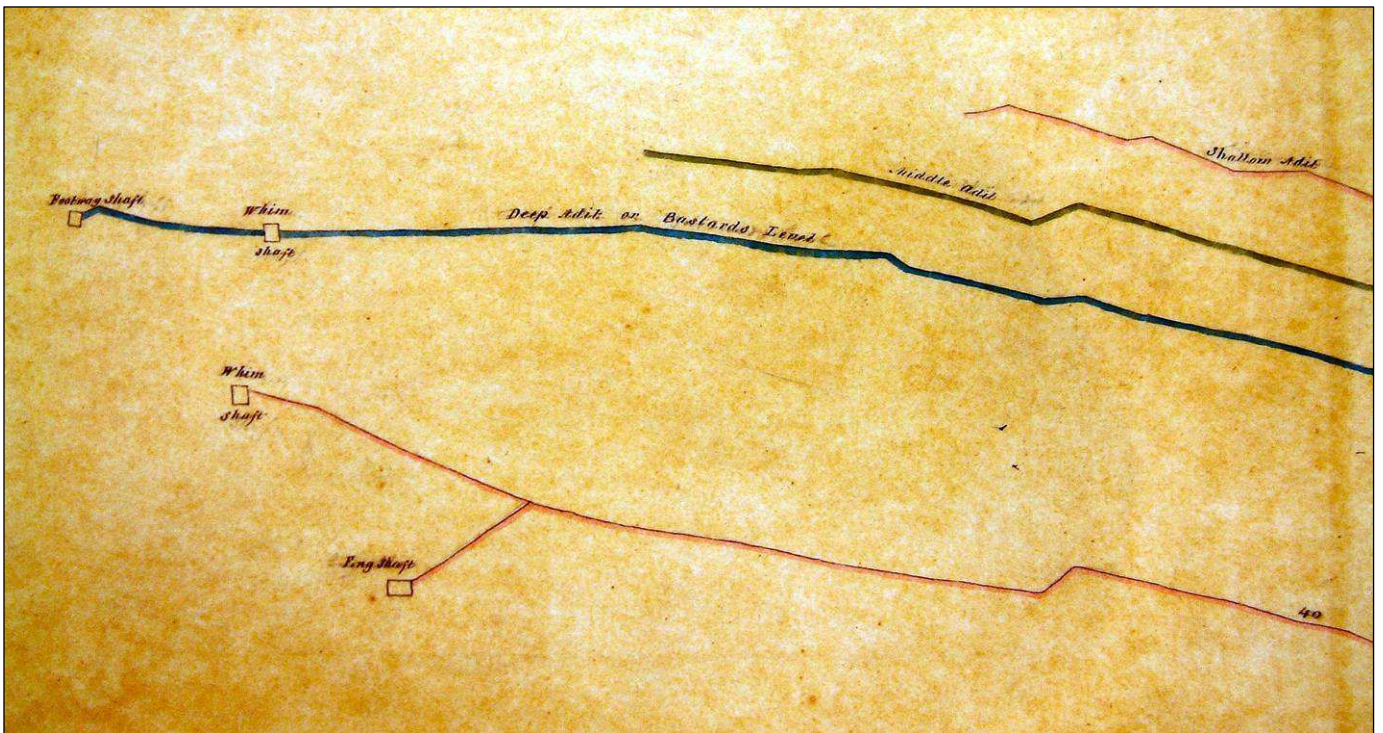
An excerpt of a plan of Devon & Cornwall United Mine (undated - DRO R98E)
